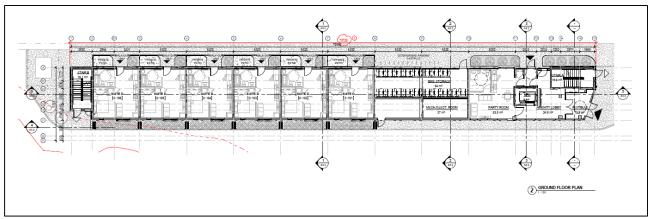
Ground Floor Plan - Dwelling Units (6) replacing Parking Spaces (12)
